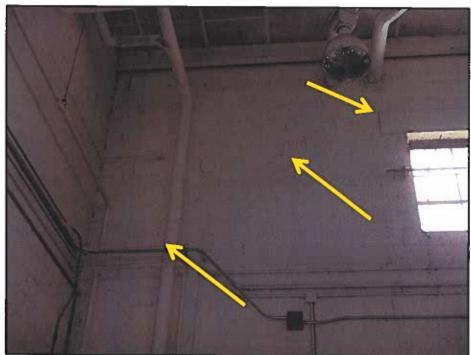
Cracks in the gym walls near the clerestory. Front left side
